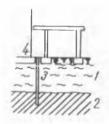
The chart of adjoining the additional building to the multi-storied part of the building. 1 - highly compressed soil; 2 - dense soil; 3 - sheet piling; 4 - the multi-storied part of the building.
